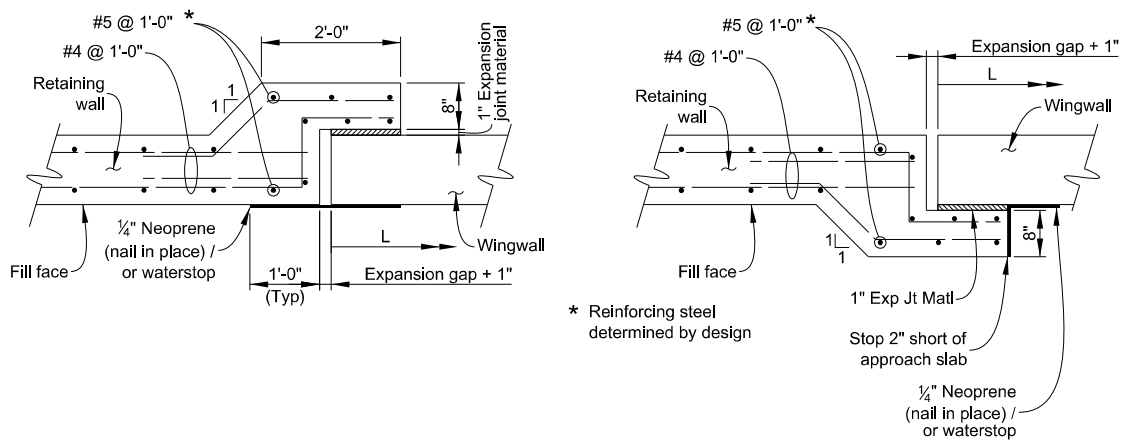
Wingwall to Retaining Wall Connection Detail
